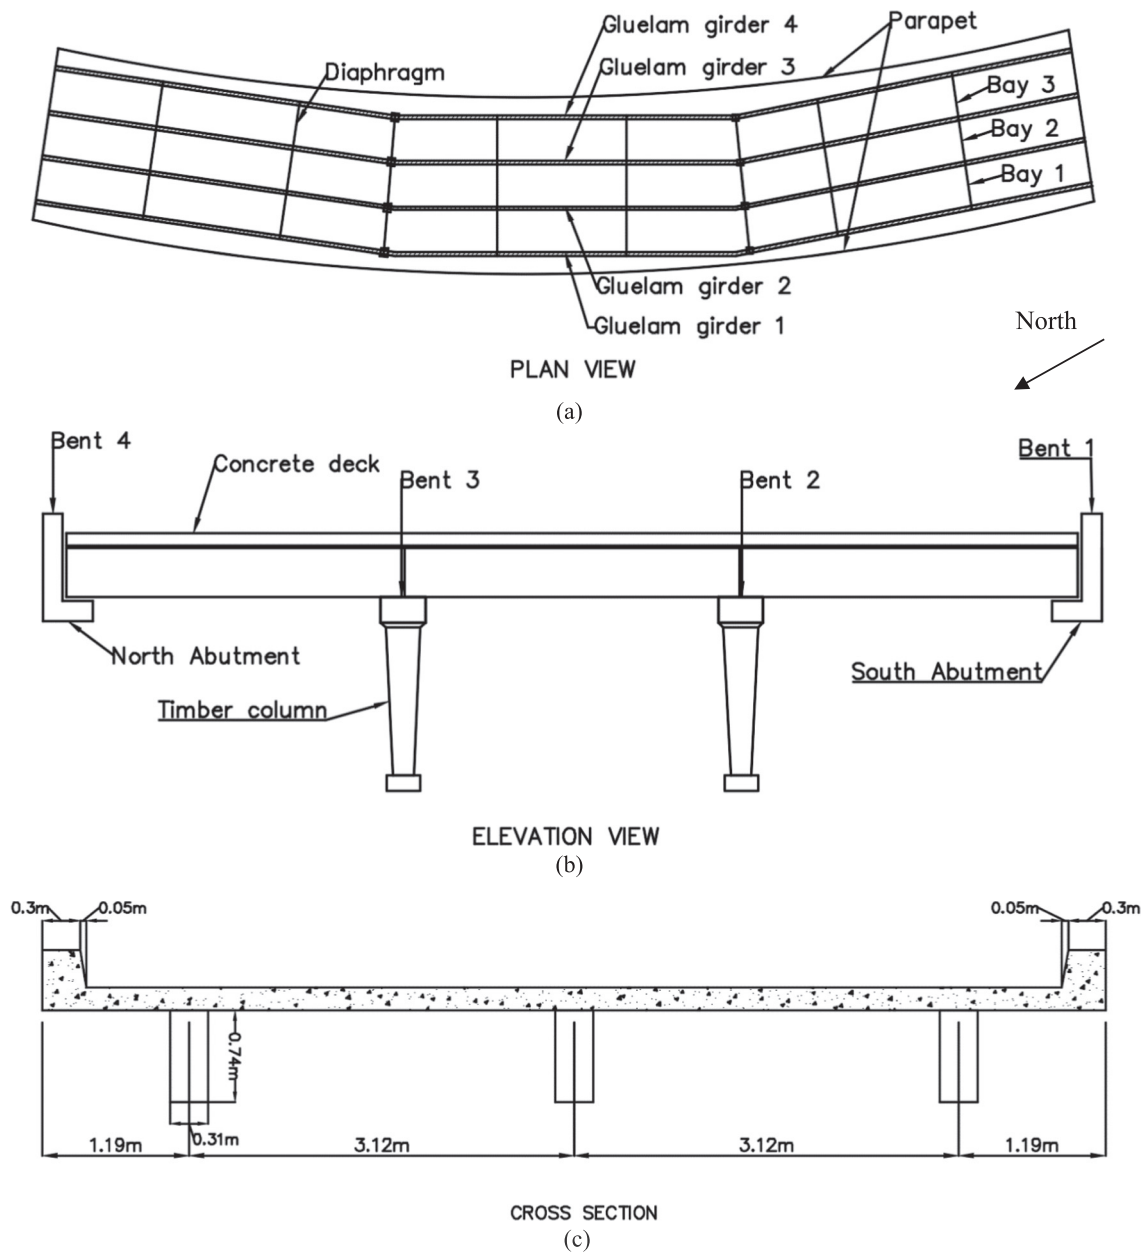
Glulam timber girder bridge components numbering: (a) component numbering on plan view; (b) component numbering on elevation view; and (c) cross-section view.
